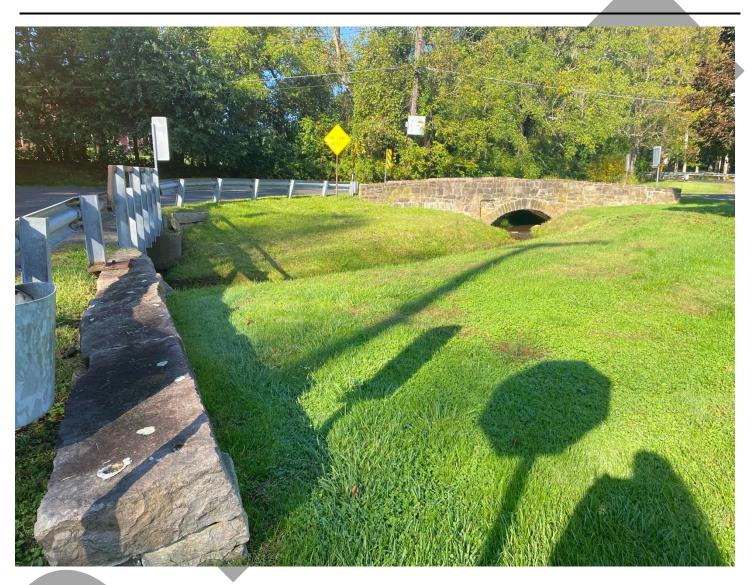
East (downstream) side of the bridge, View facing west from the adjacent bridge on Dunkard Church Road
